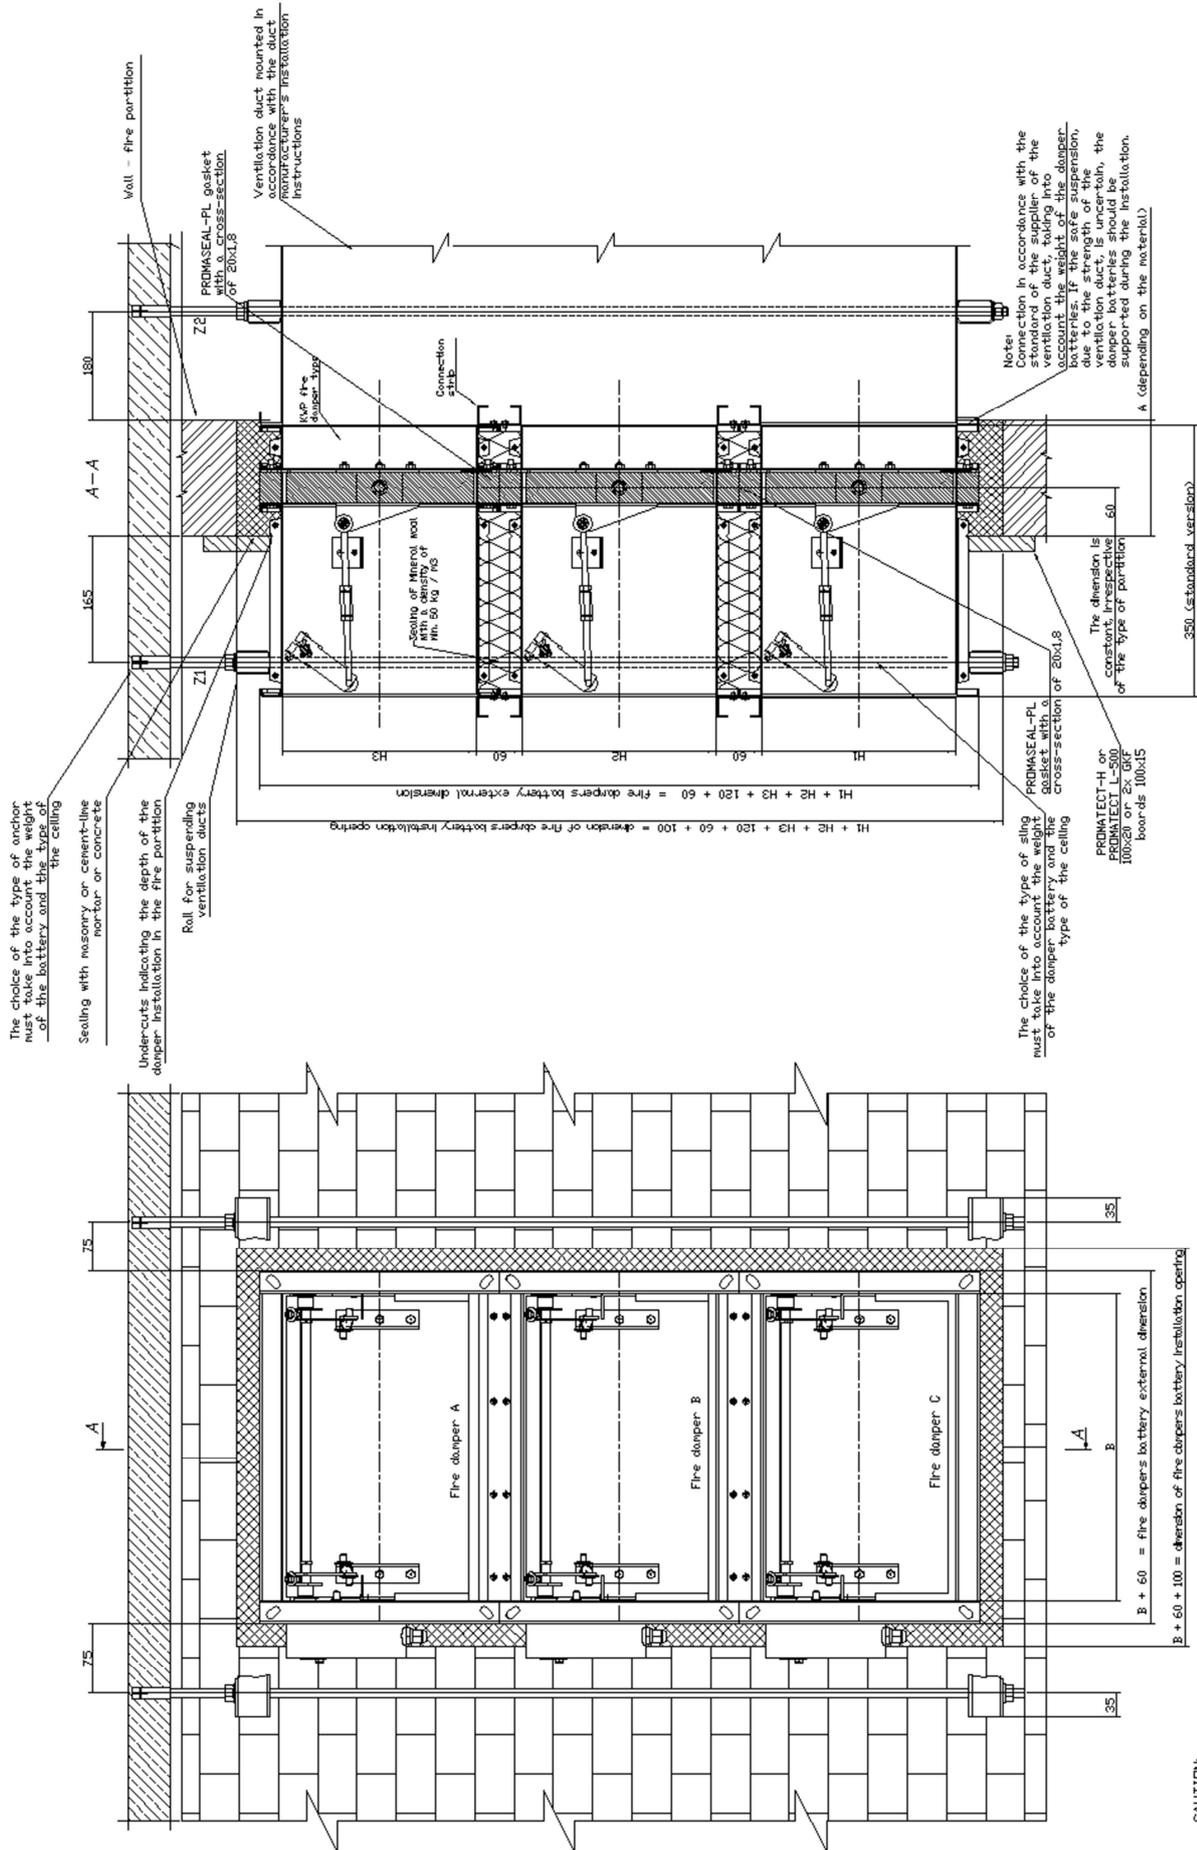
Installation of a battery consisting of three fire dampers KWP in vertical arrangement in wall
